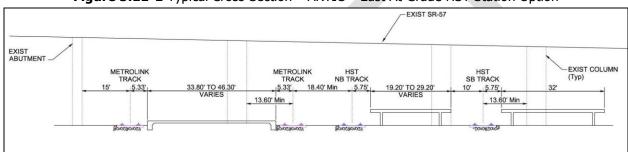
Typical Cross-Section – ARTIC – East At-Grade HST Station Option
